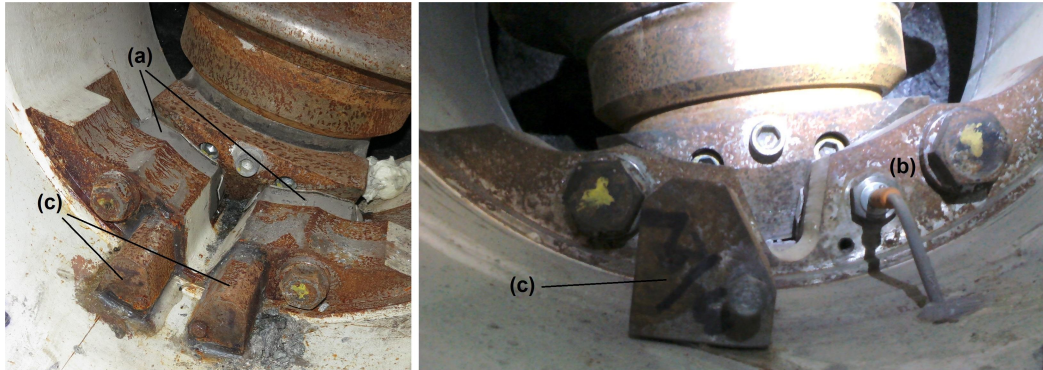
Inserts between saddle and cutter (a), measurement bolt with cable (b), protective steel cap (c)
